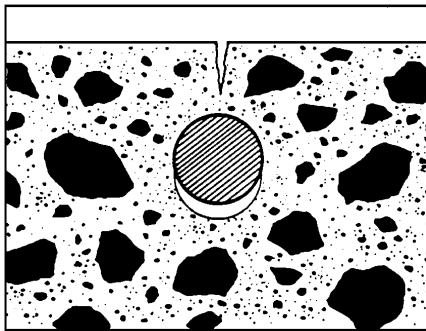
Subsidence cracks can develop over reinforcing steel as the concrete settles or subsides.
